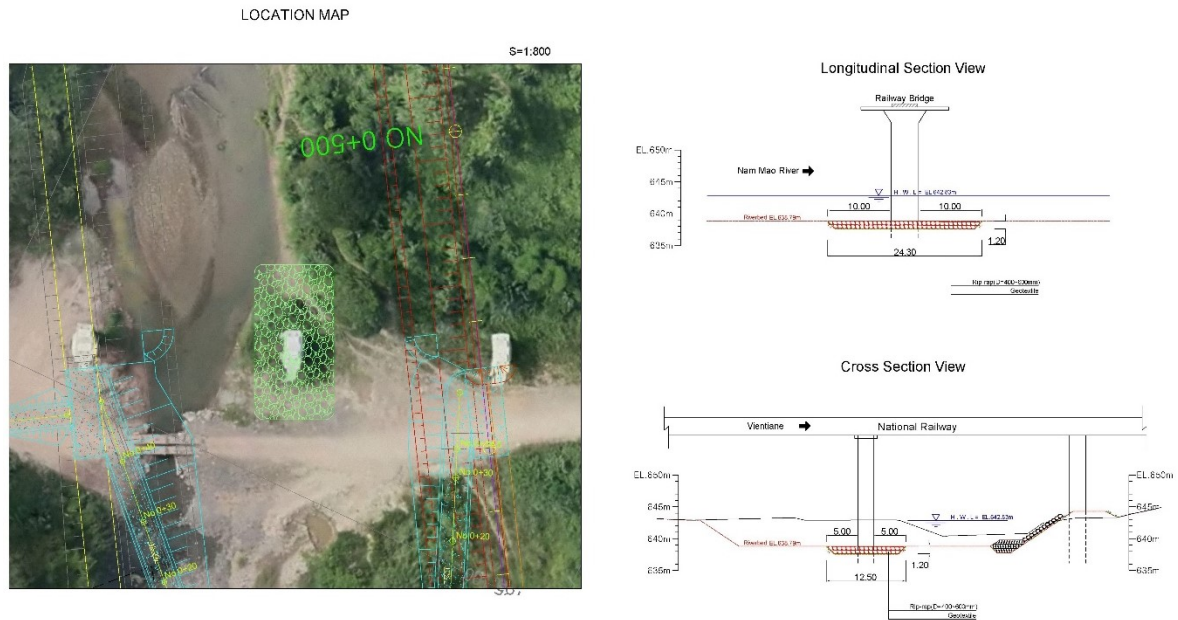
Detail Design of the Scouring Protection at Railway Bridge
